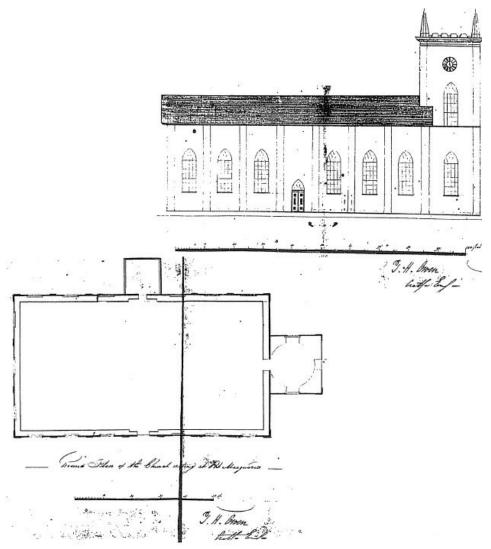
Plan and elevation of St Thomas', notation "Ground plan of the Church erecting at Port Macquarie" Source: St Thomas' Archives.
